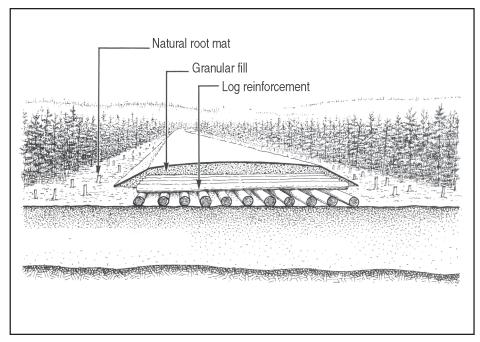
Elements of a road crossing through a swamp wetland, cross section (Ontario MNR, 1990).
